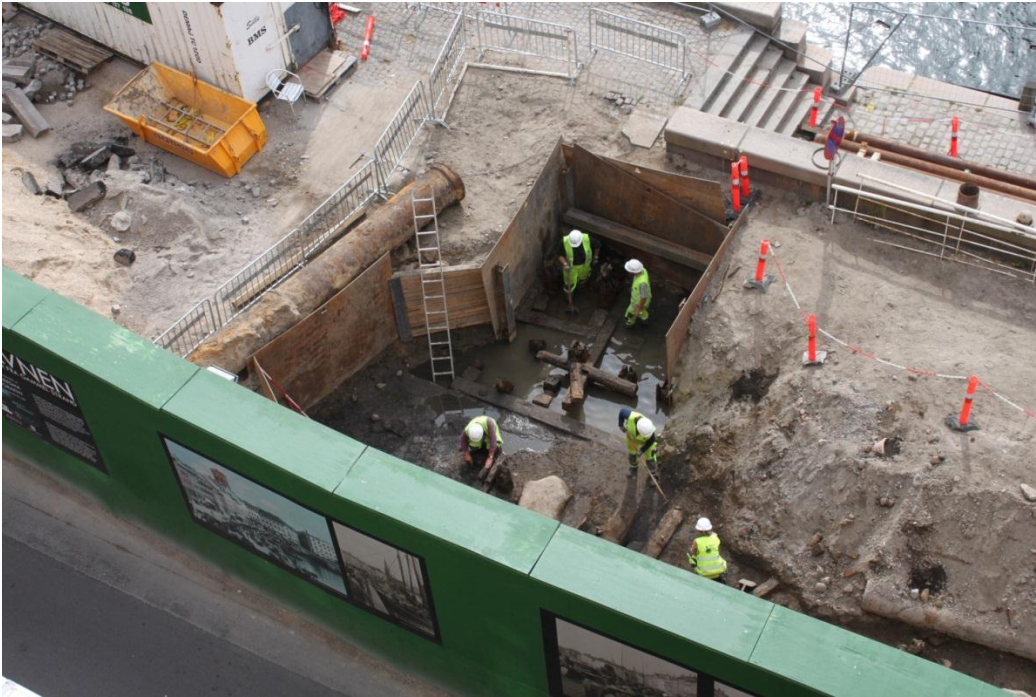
Gammel Strand Guide Wall Trench 3, From above. C19_20120824_3702
